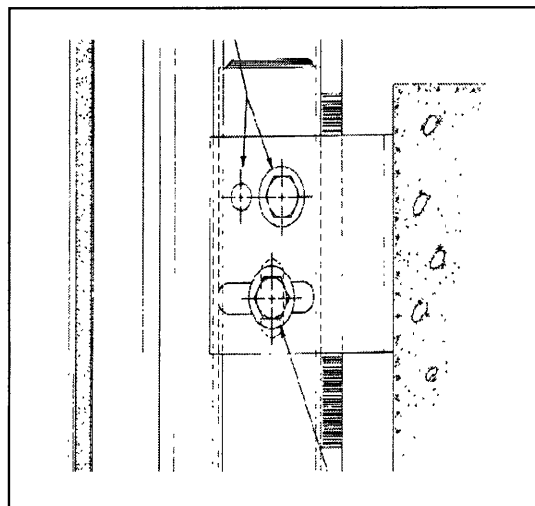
Connection detail of a vertical frame member, a mullion, anchored to spandrel beam of a structural frame.
